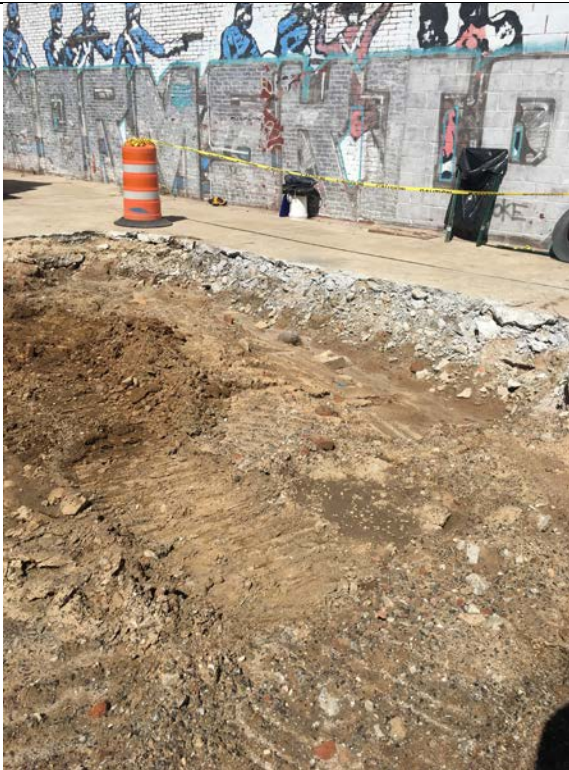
View of Trench 7 facing southwest. Photo taken June 26, 2017.
